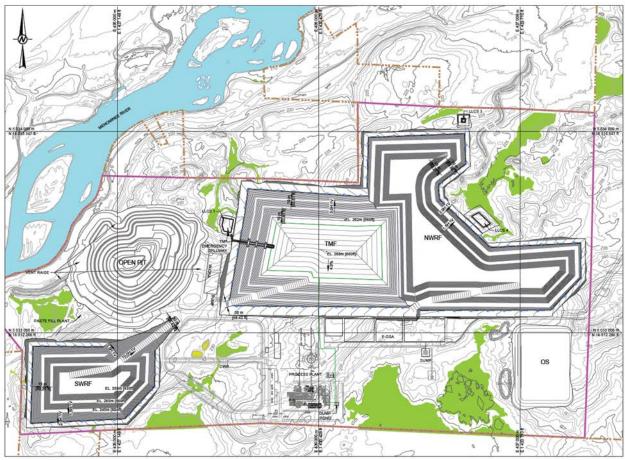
GENERAL ARRANGEMENT PLAN OF THE TMF, WRFS AND OS
